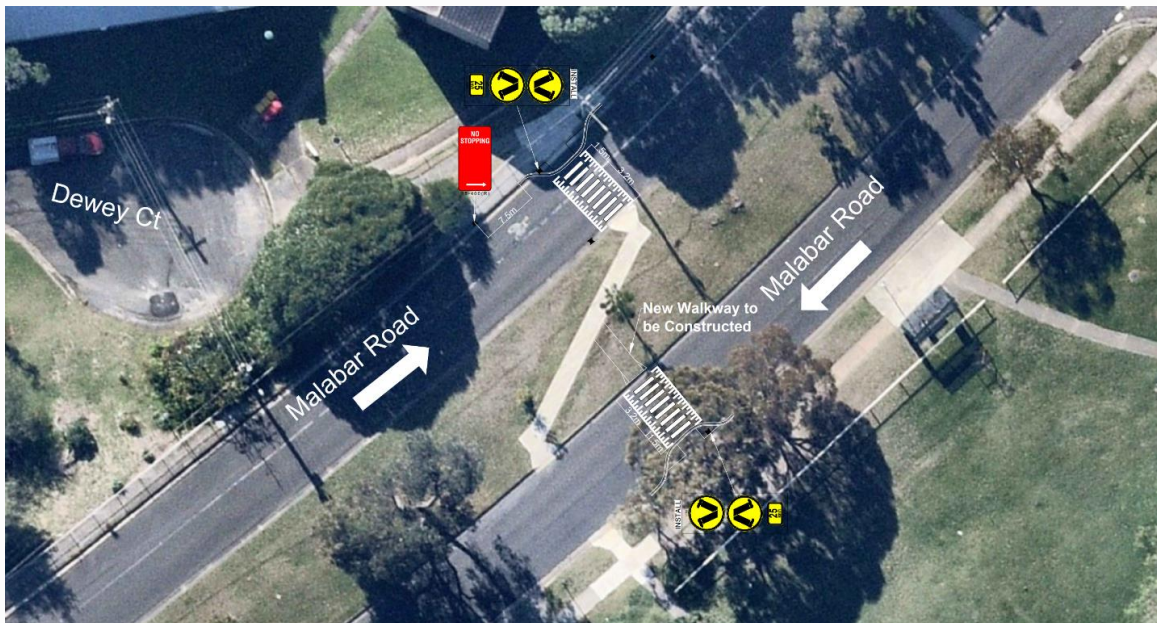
Concept Plan of pedestrian crossings on Malabar Road
